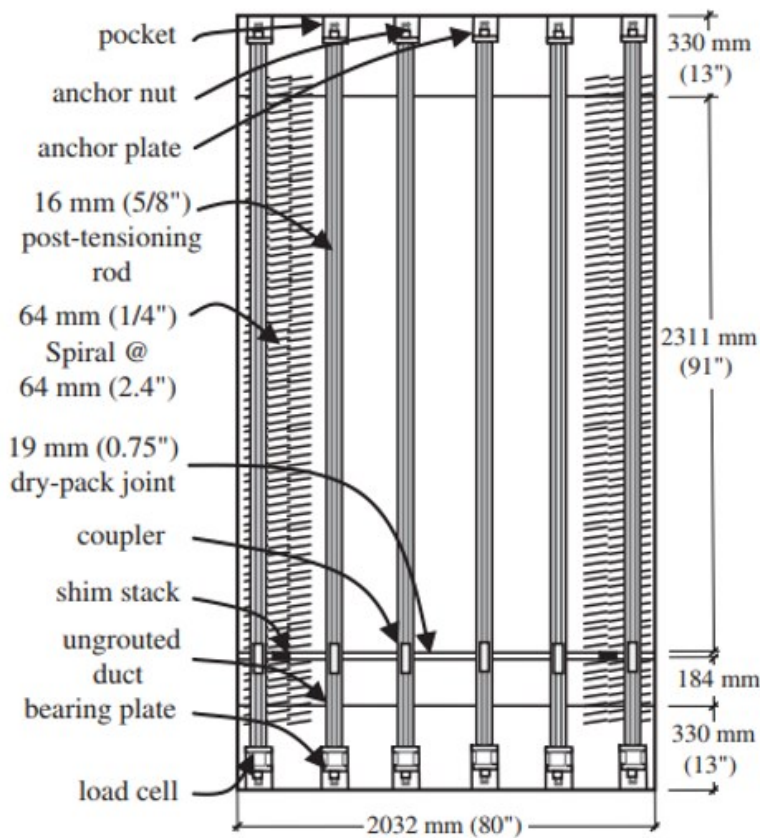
Details of unbonded post-tensioned shear wall specimens [30]
